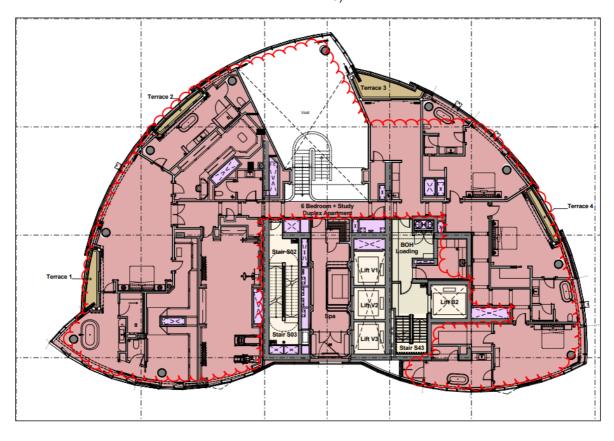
| Proposed 6 bedroom + study duplex apartment layout on Level 49 (Source: MOD 3)
